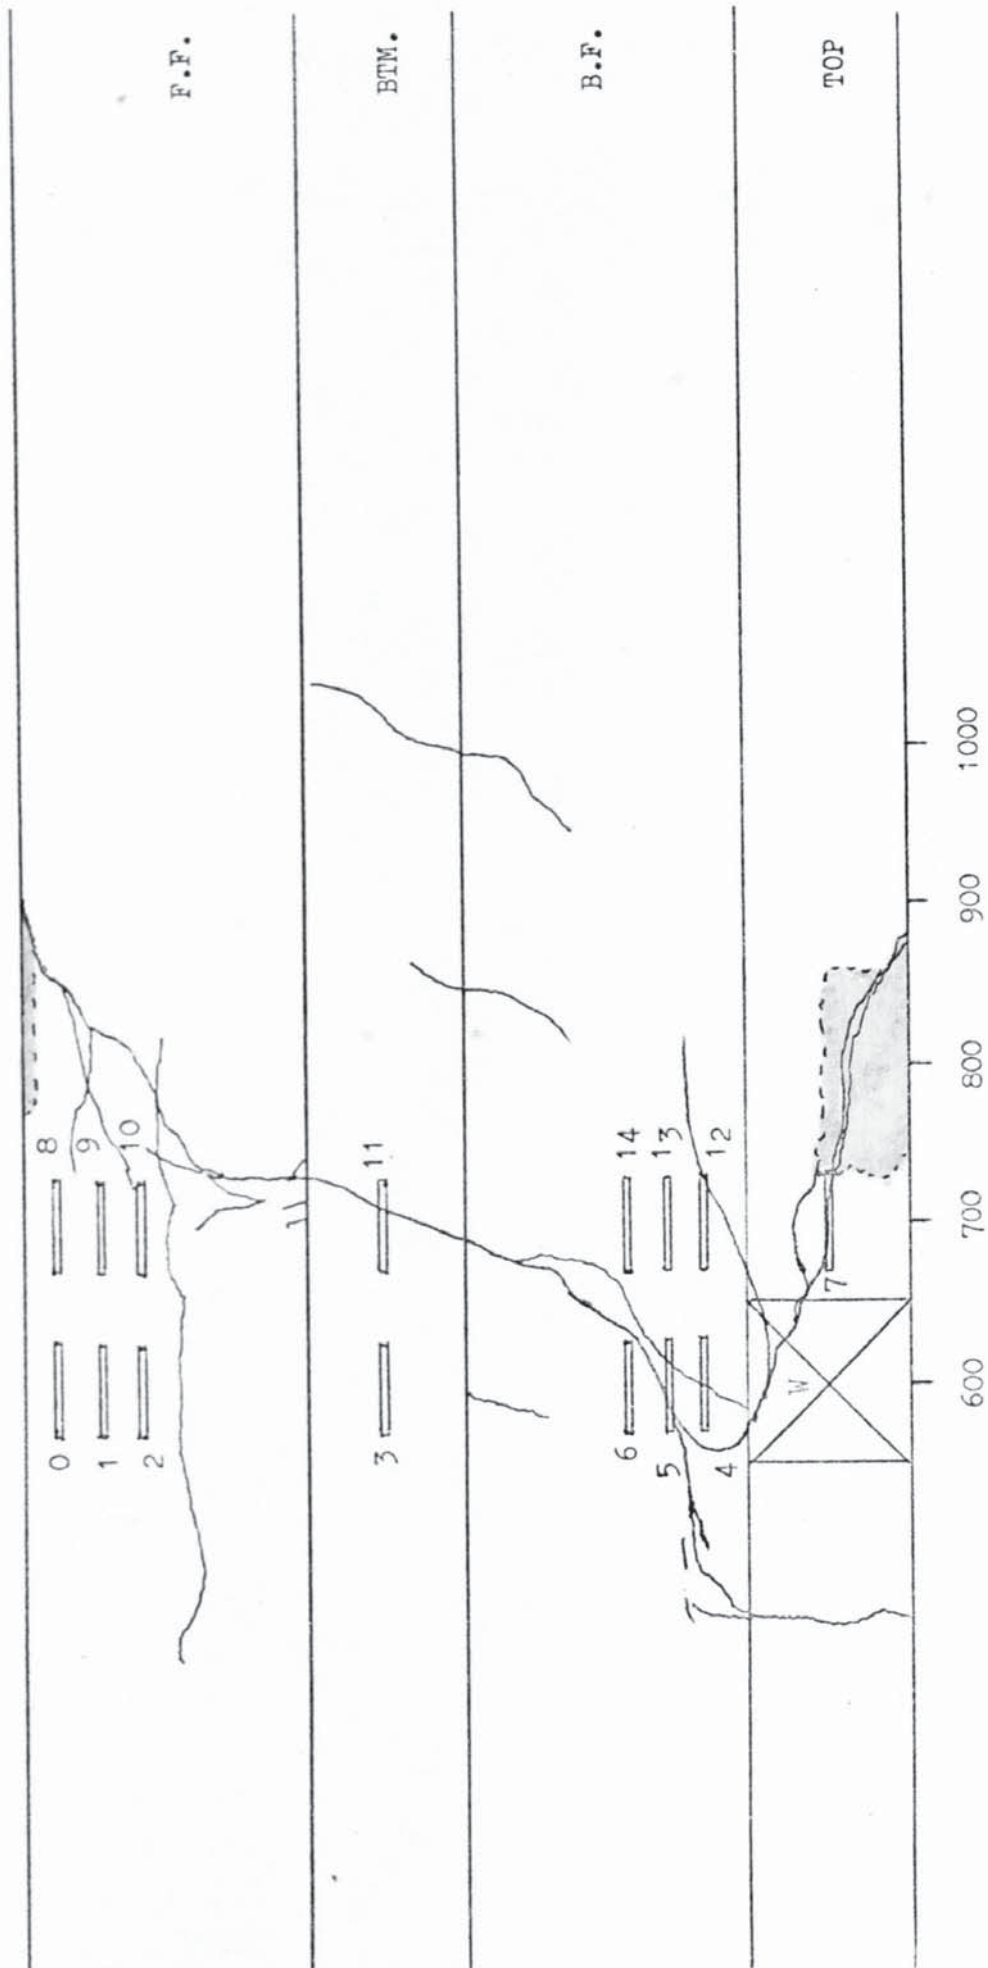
FAILURE CRACK PATTERNS - BEAM 30 ( MODE 1 )
